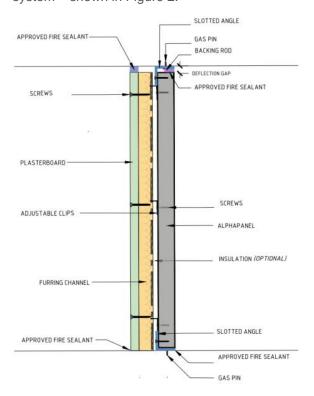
AlphaPanel wall for -/60/60 applications – minimum 35 mm thick AlphaPanel with minimum 1 \times 13 mm fire rated plasterboard (minimum wall thickness 88 mm)
